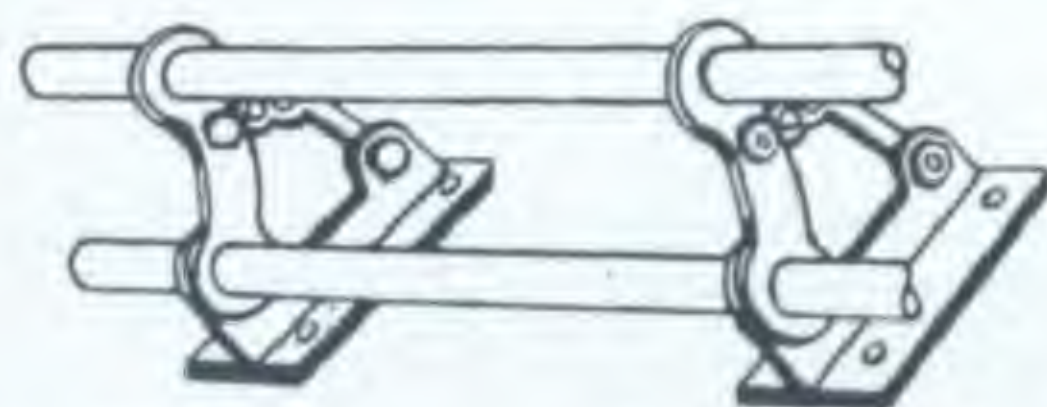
BRACKET AND PIPE SNOW GUARDS
